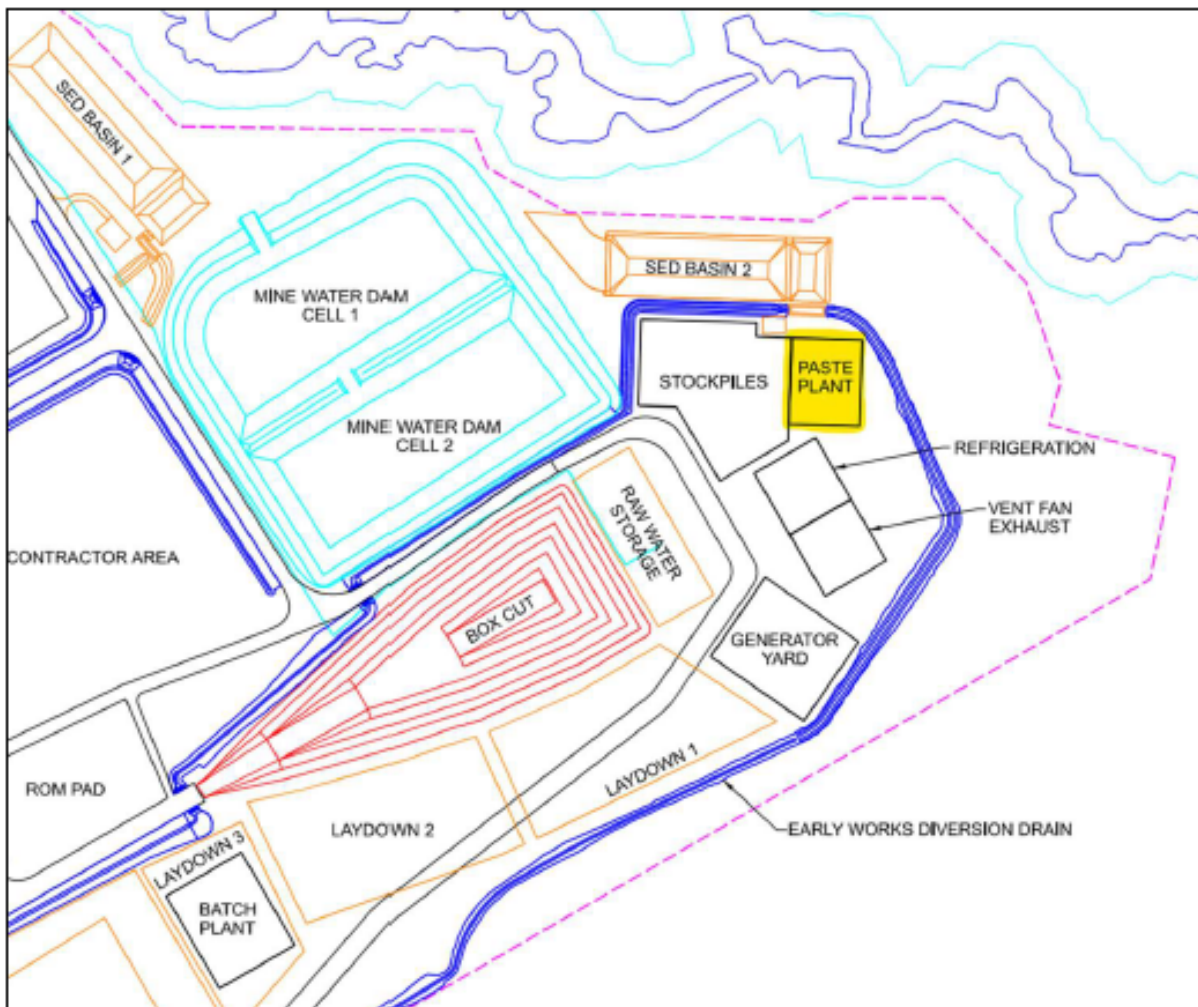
Proposed location of the paste plant at BP33 mine site
